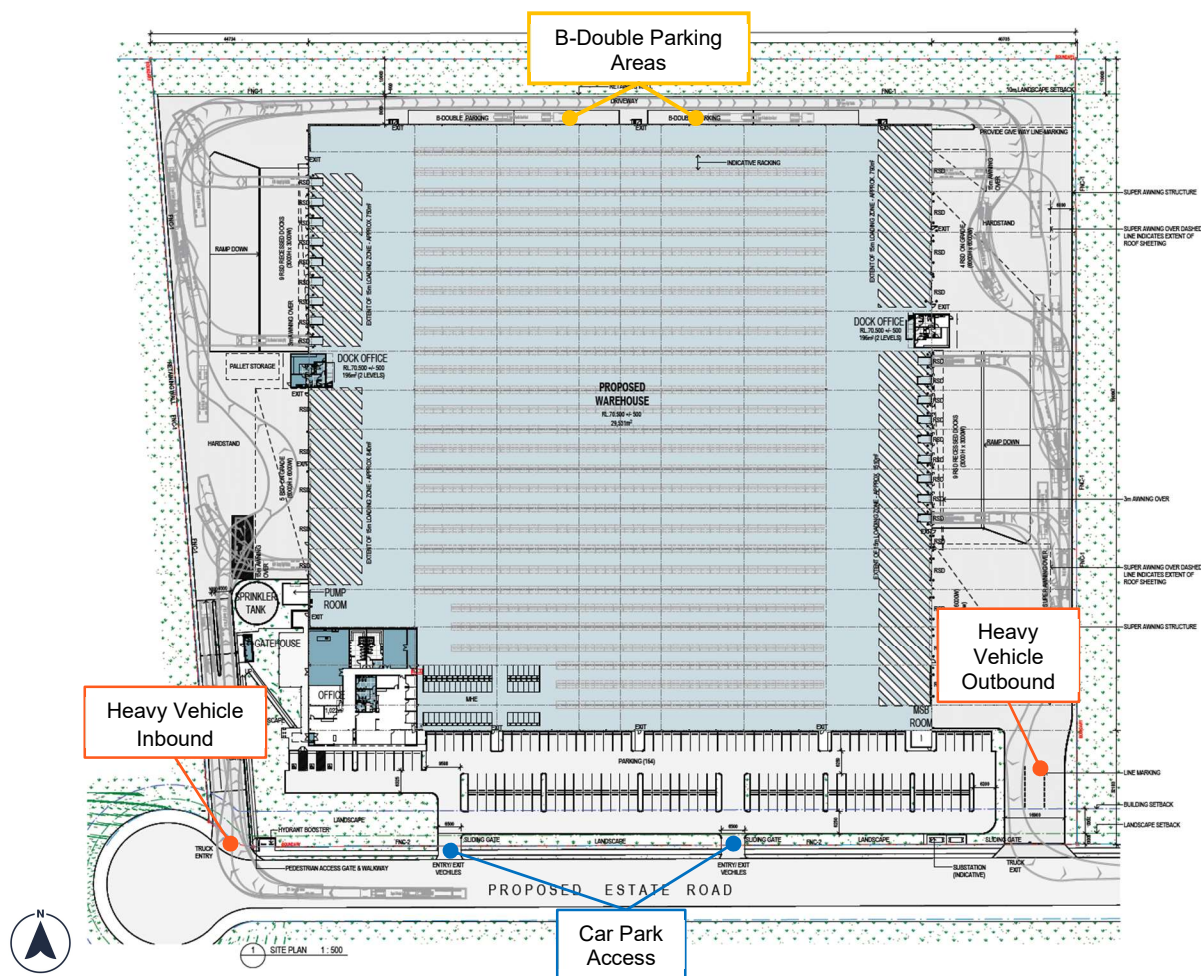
| Proposed Site Accesses and B-Double Parking Areas
